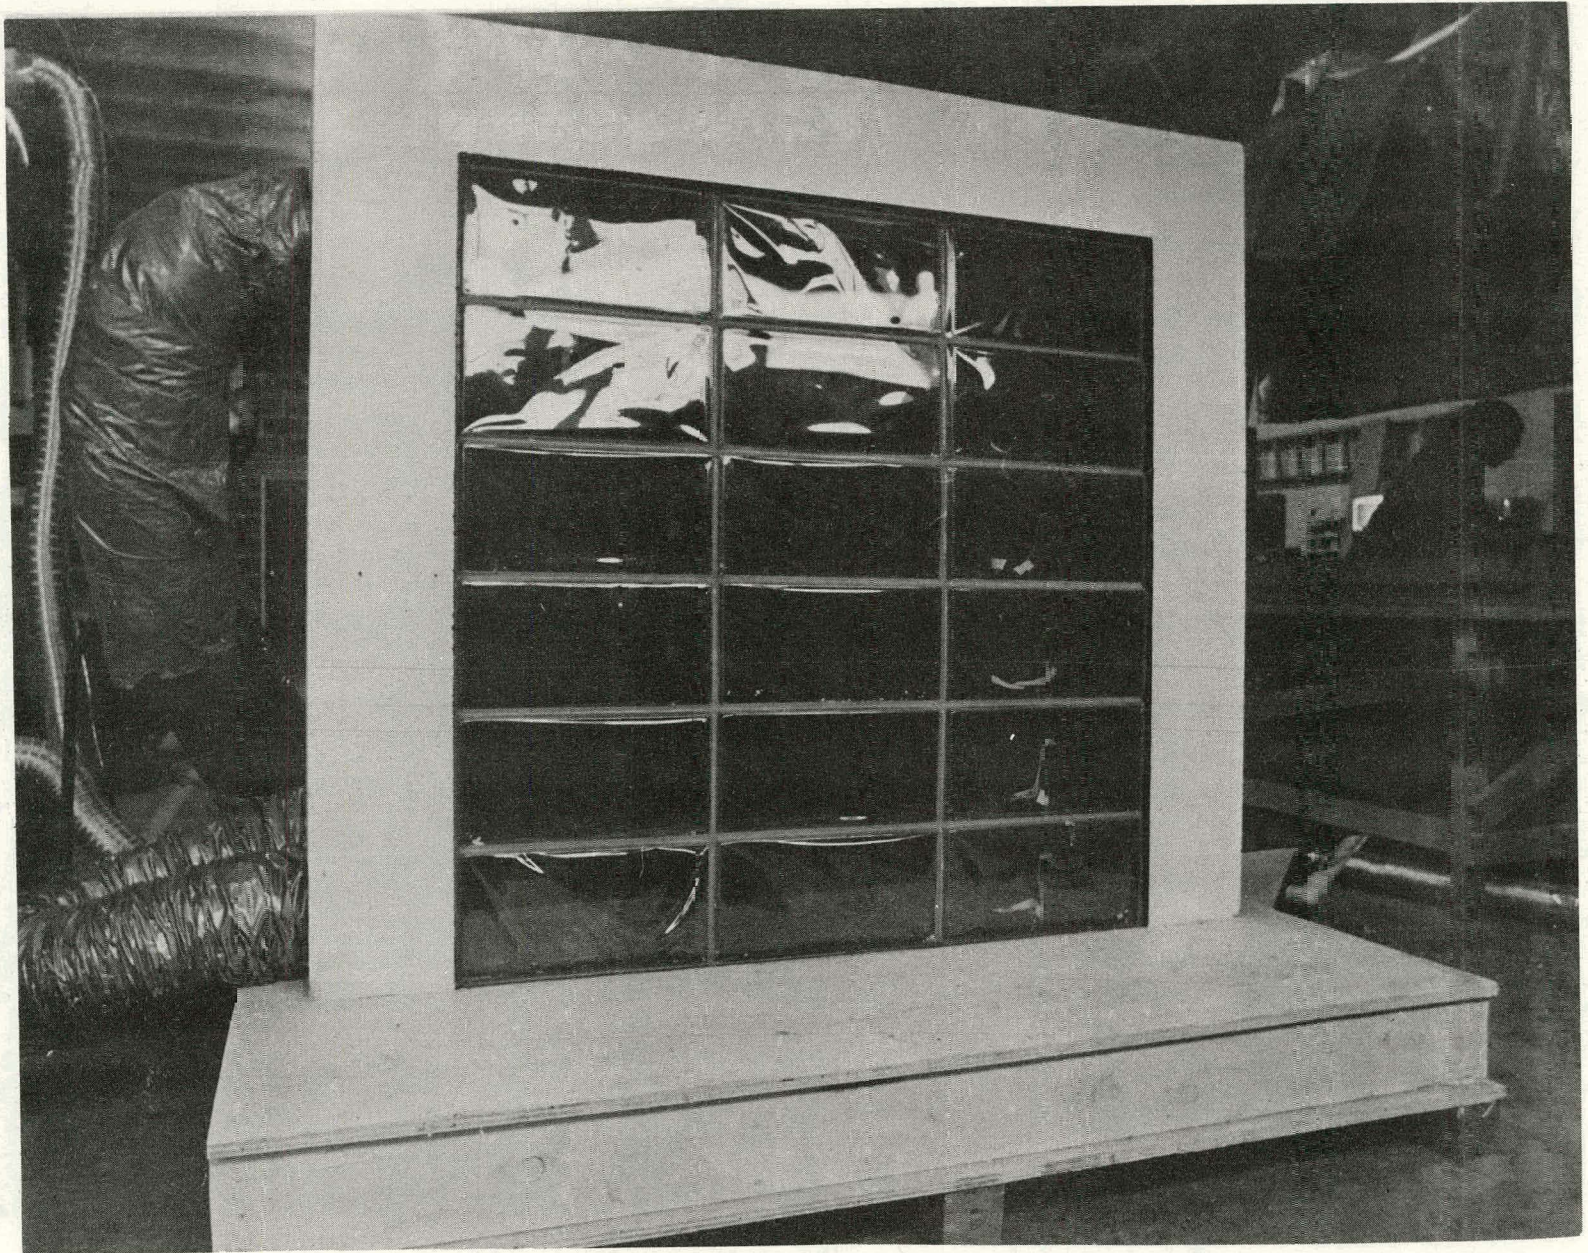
A test section wall of the open face block design in a "stack bond" configuration. The sides and back are insulated. Glazing is molded acrylic covers over Teflon film.
